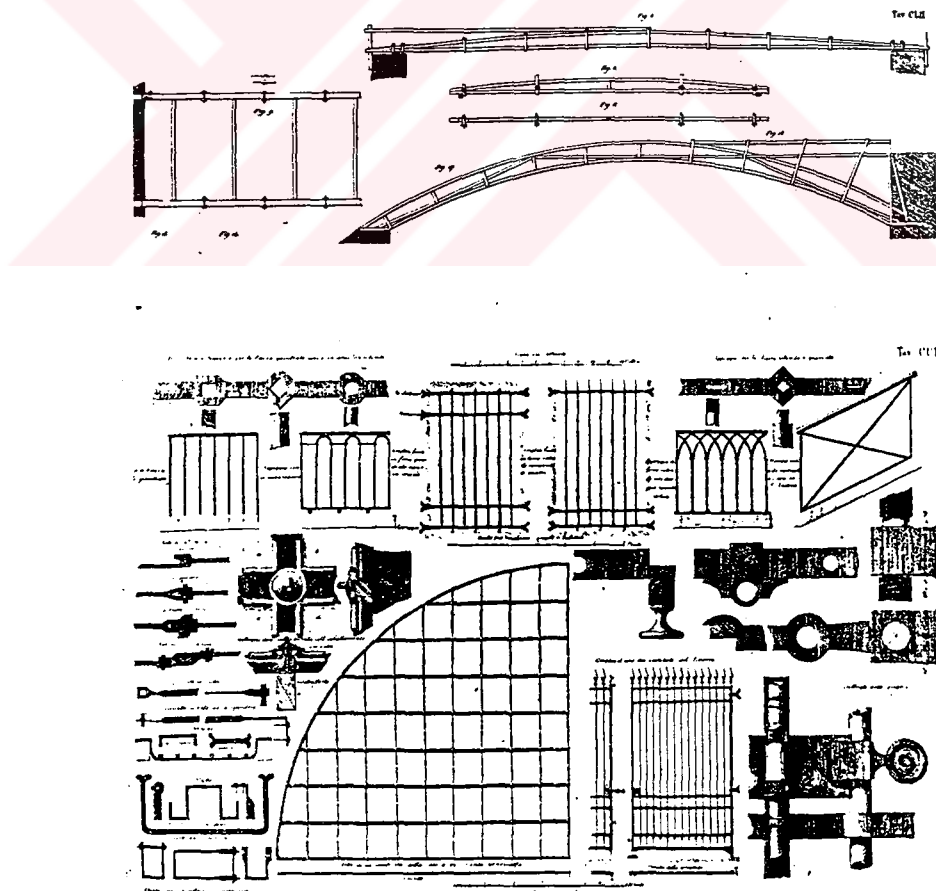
Steel Details and Structural Systems Early 19 th. Century, Rondelet.
